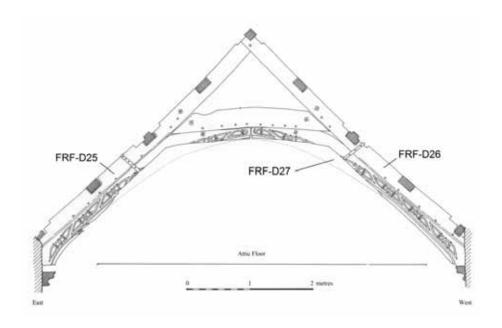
West range; truss 3, showing the location of samples FRF-D25-7 (Alan Graham)
